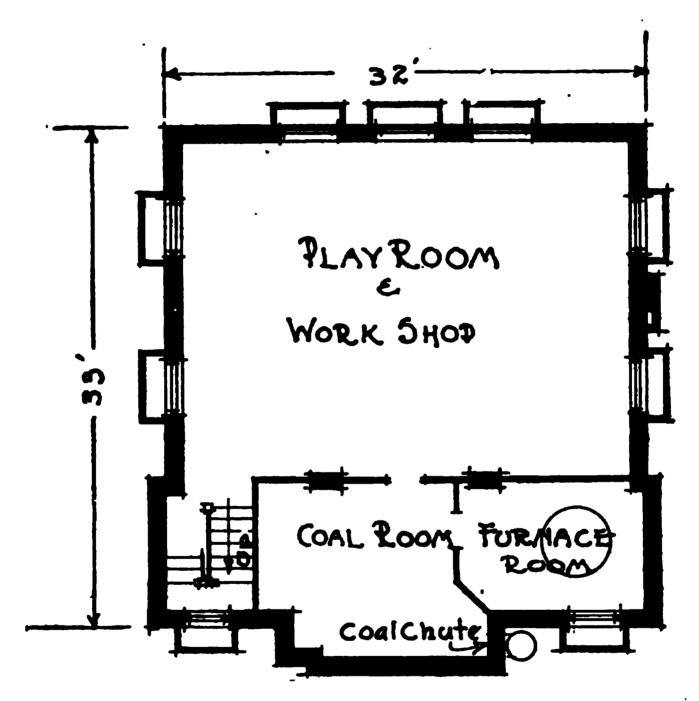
Basement plan, Crossroads School, Macon Co., Ill.
